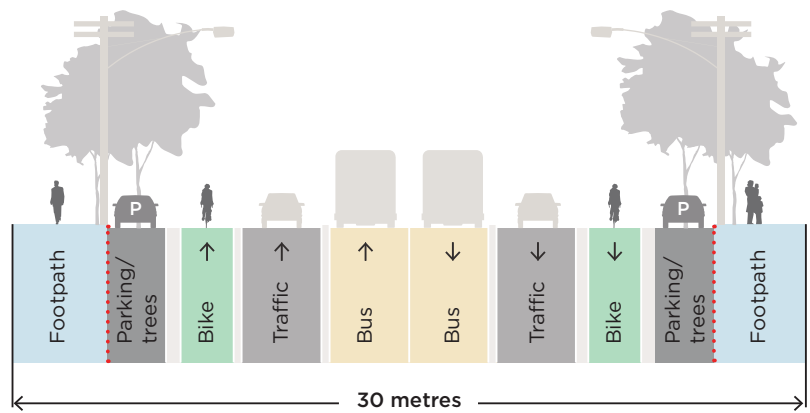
Potential typical street section for Spencer Street in the medium term.
